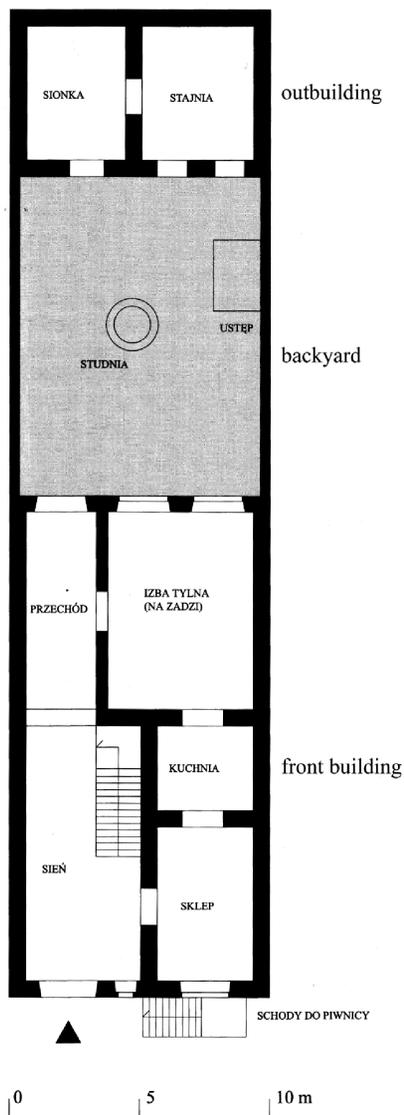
Plan of a typical Kraków townhouse's ground floor, based on: W. Komorowski [23]
